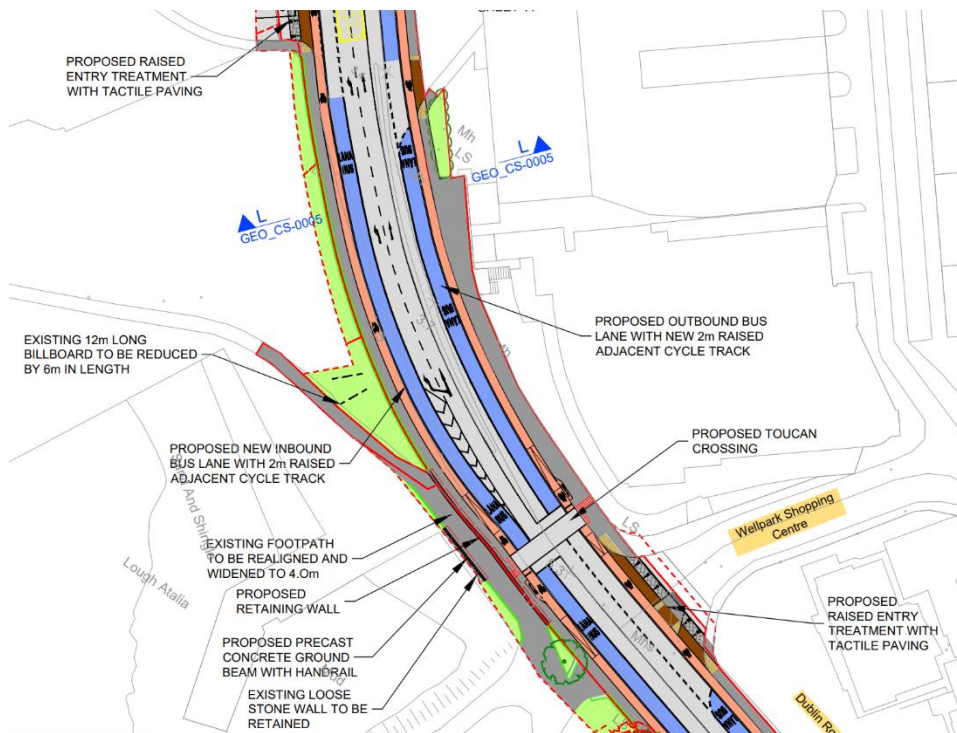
General Arrangement of Proposed Scheme at Dublin Road
